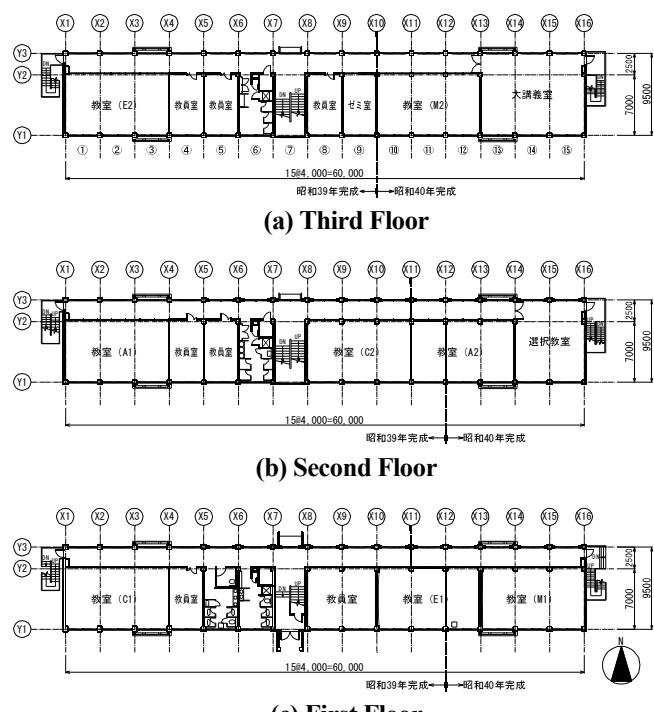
Floor Plans of the Building for Students in the Lower Grades
